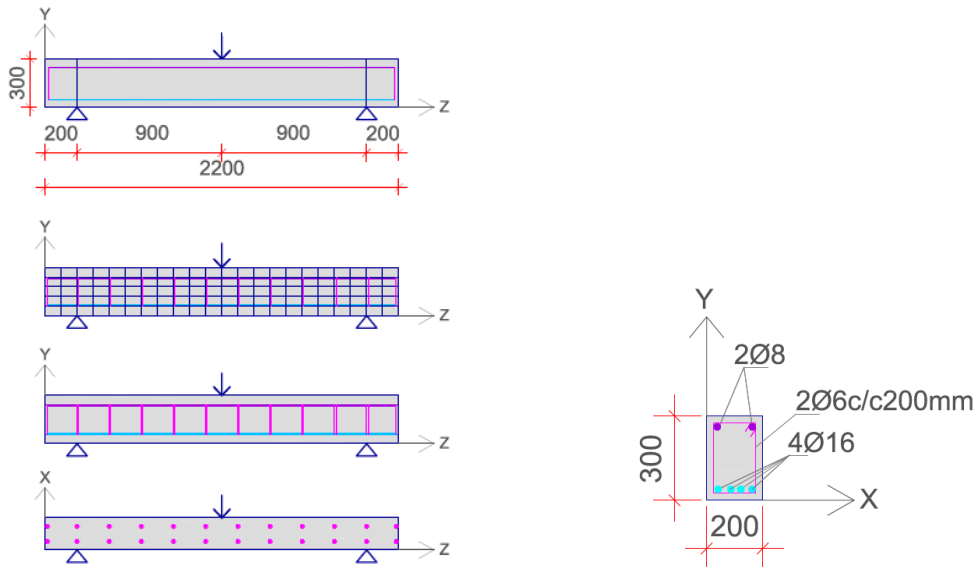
4 - Reinforced concrete beam model and cross section in Vector-3 (B1)
